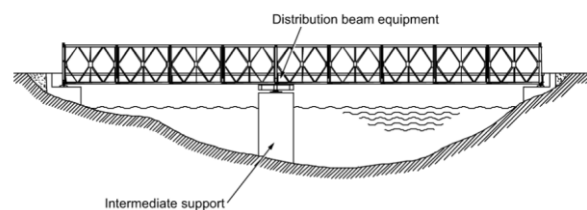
Distribution Beam equipment at the intermediate support, adapted from Mabey Bridge (2014)
